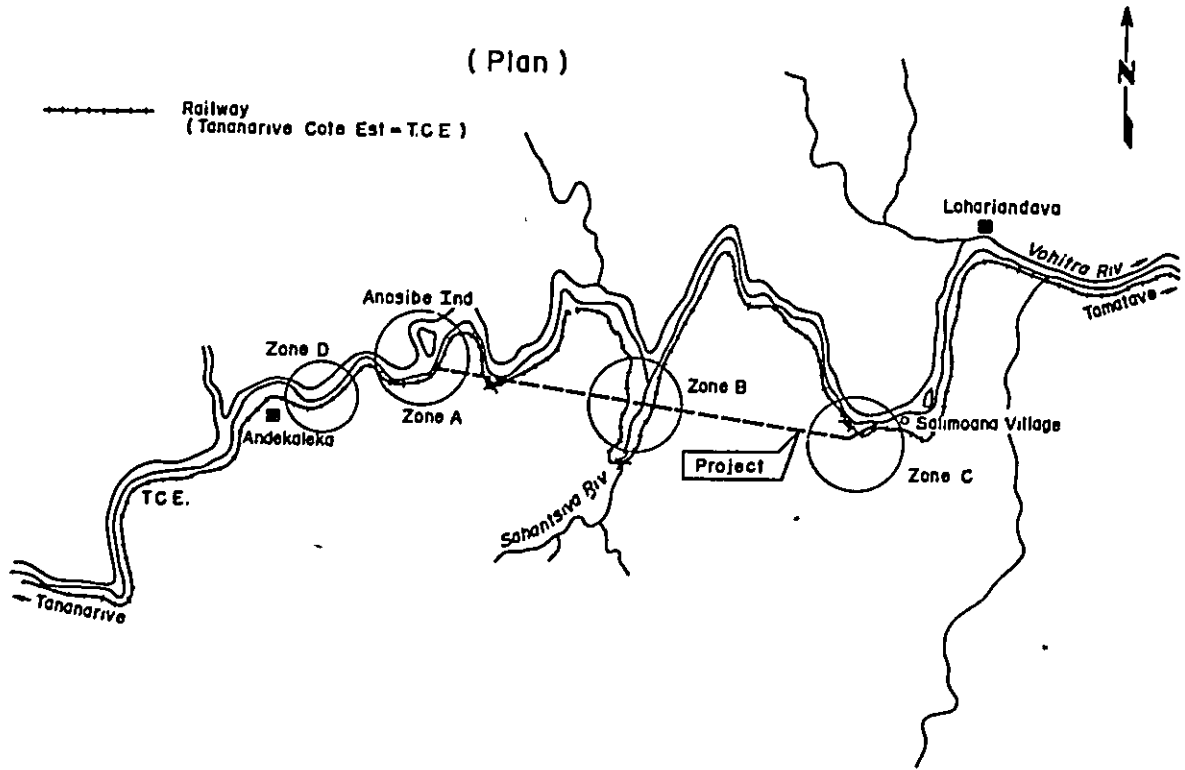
Plan of Conduit Tunnel and Principal Direction of Schistosity and Joint Planes of Foundation Rocks
